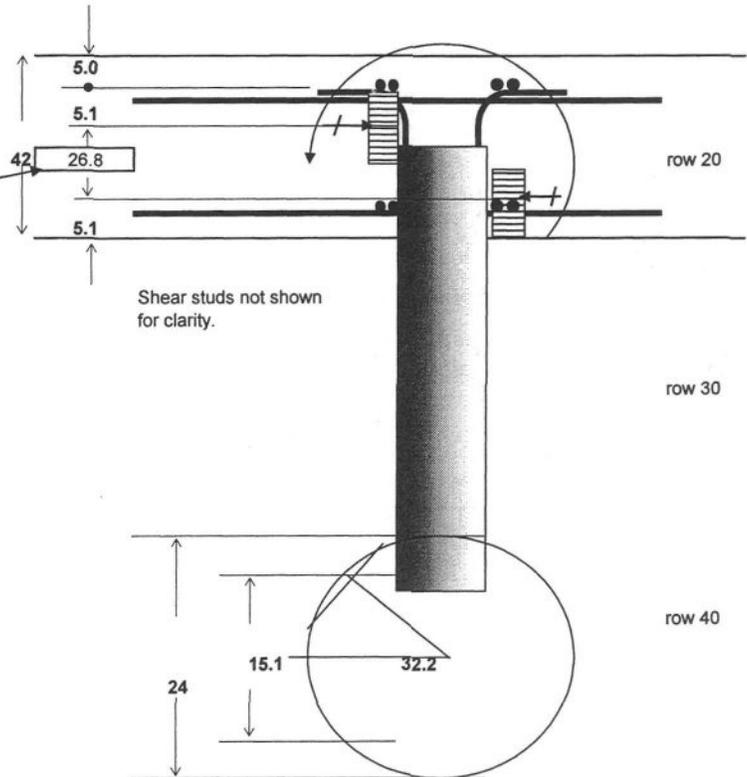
An elevation and plan view of the slab column moment transfer mechanism.
